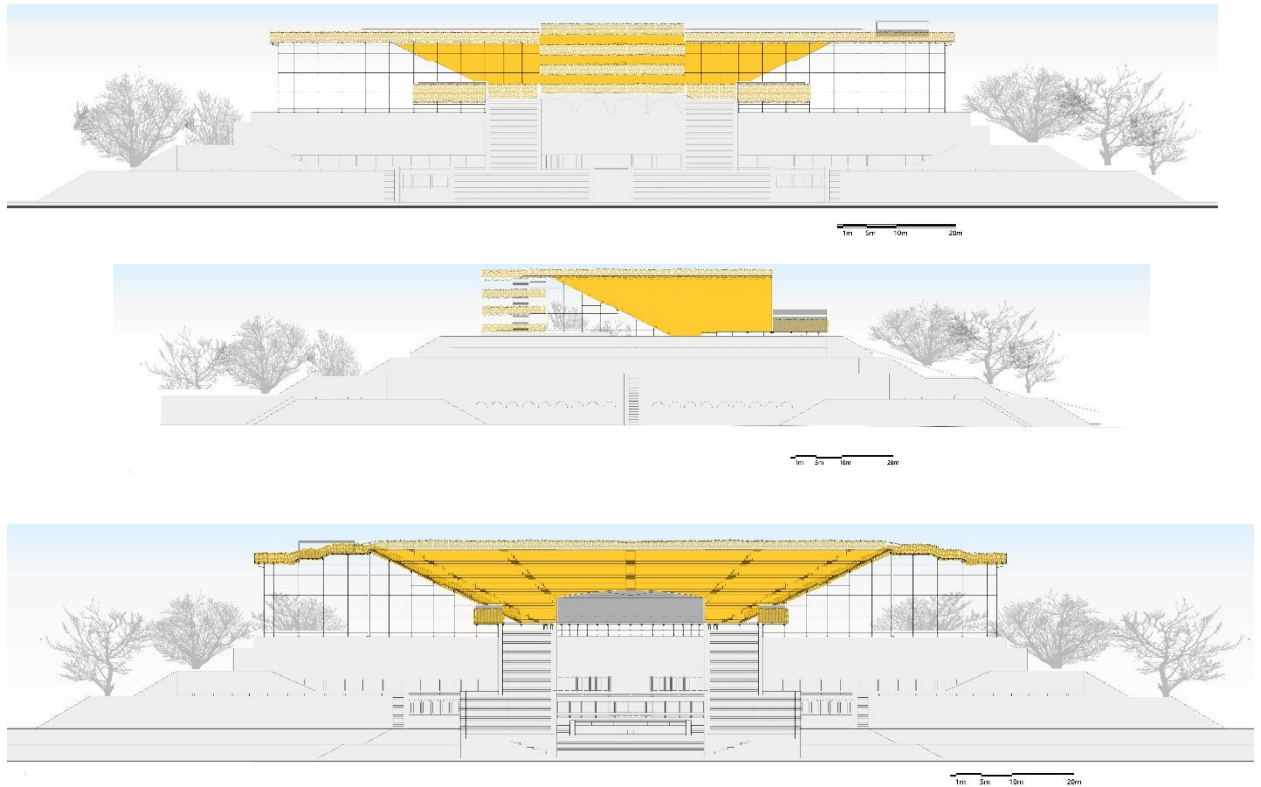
; Elevation drawings South, East-West, North in order (Appendix IV)
